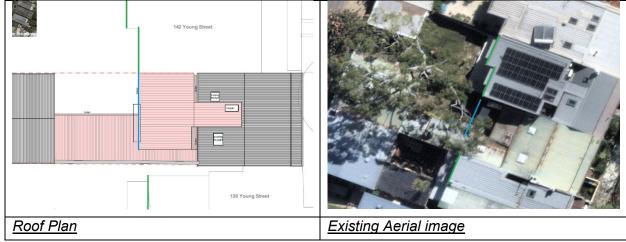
Existing and proposed rear first floor additions BLZ compared to adjoining properties.
